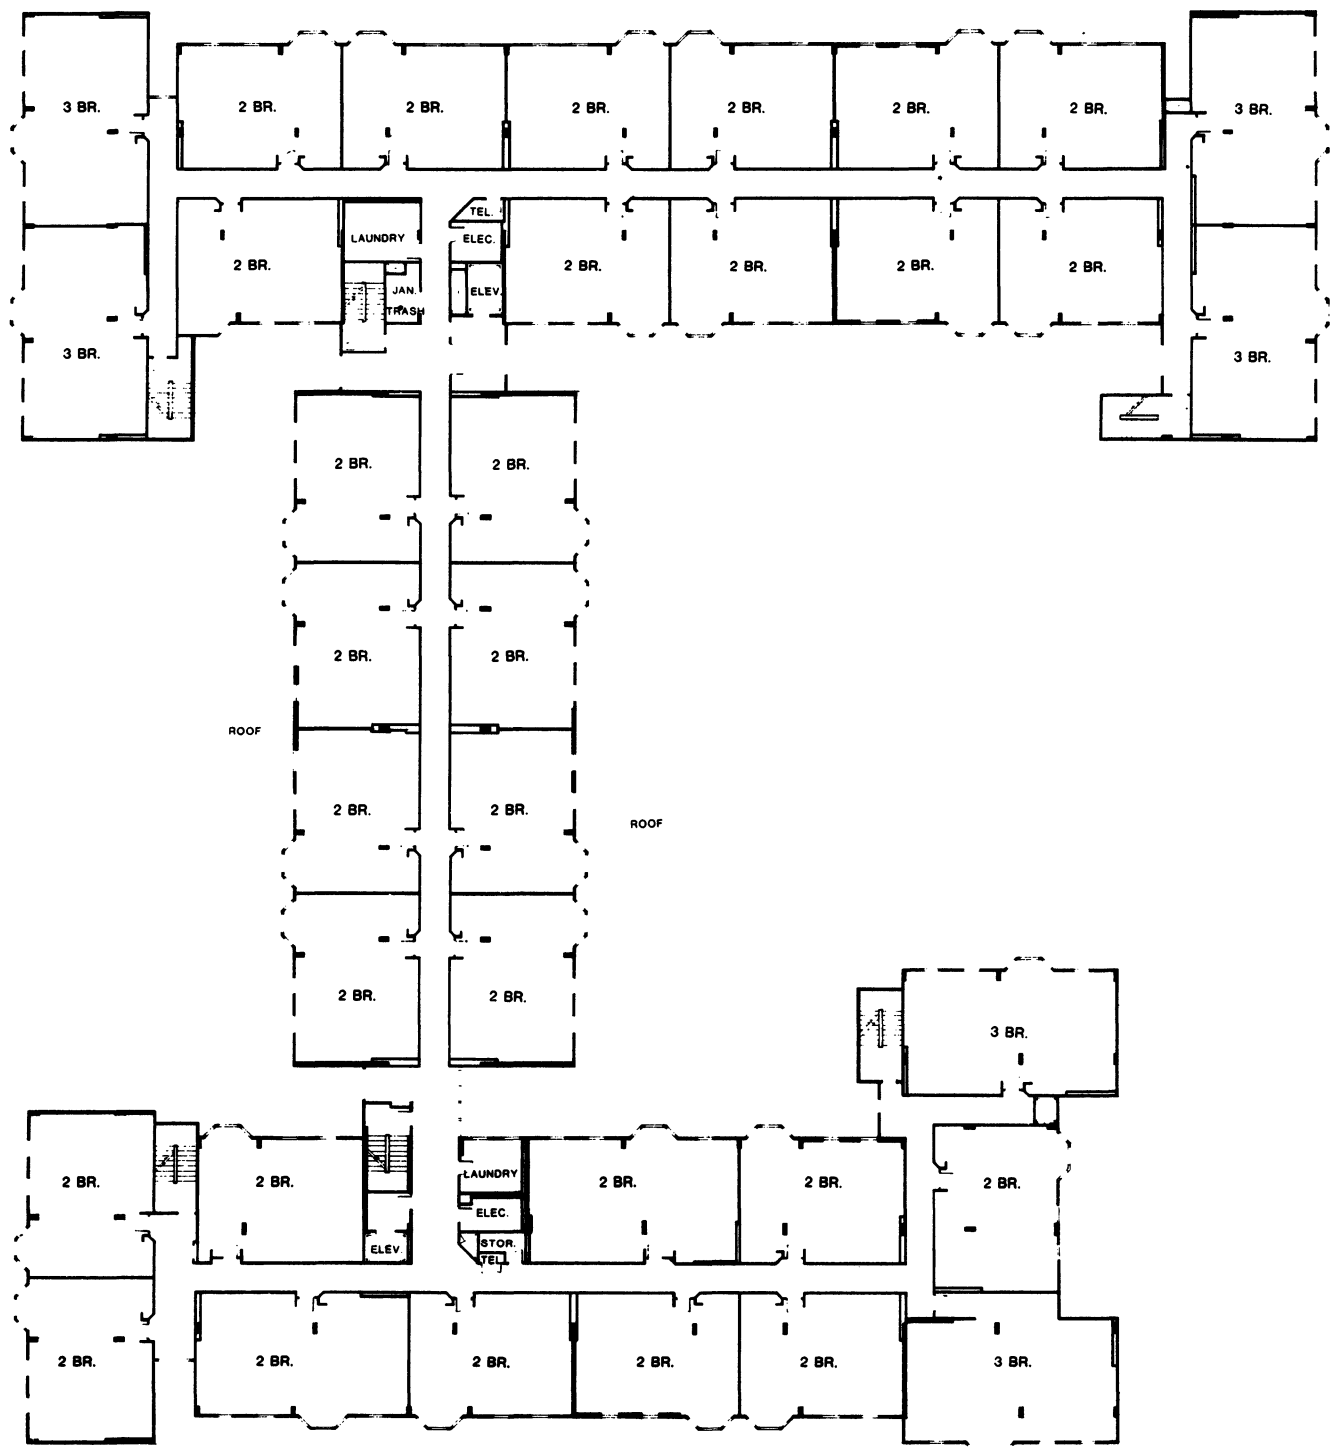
Typical floor plan of Decatur Place, 1155 Decatur, Denver, Colorado
